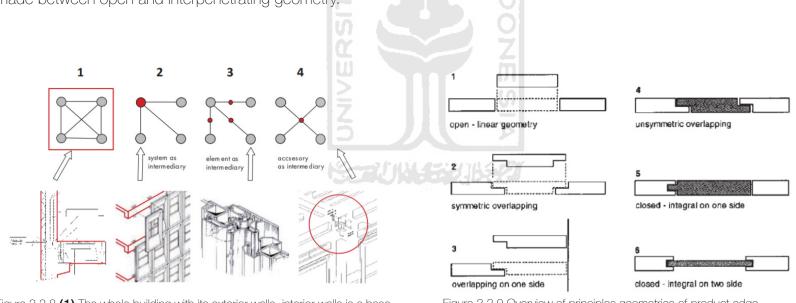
(1) The whole building with its exterior walls, interior walls is a base (2) loadbearing structure as a base element (building level) (3) frame within a system as a base (system level) (4) intermediary connection which connects multiple elements as a base (element level) Source: Durmisevic (2019)
